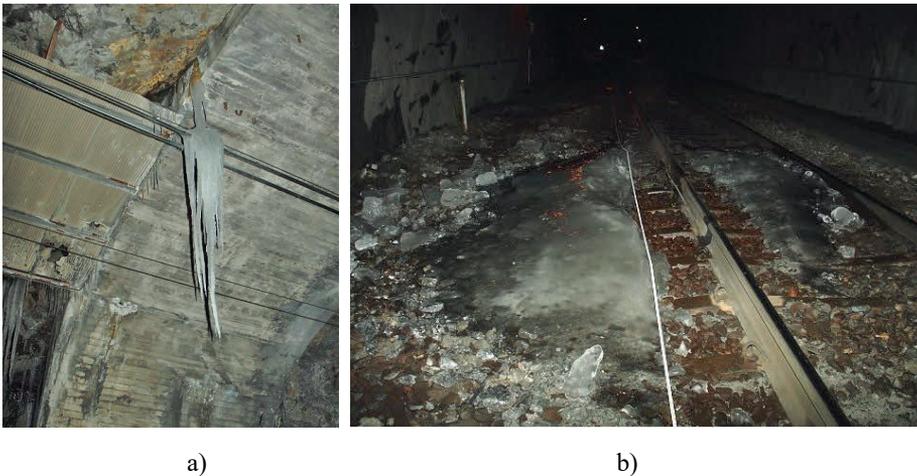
a) Icicle in the roof of the Rönninge tunnel (Andrén, 2008).
